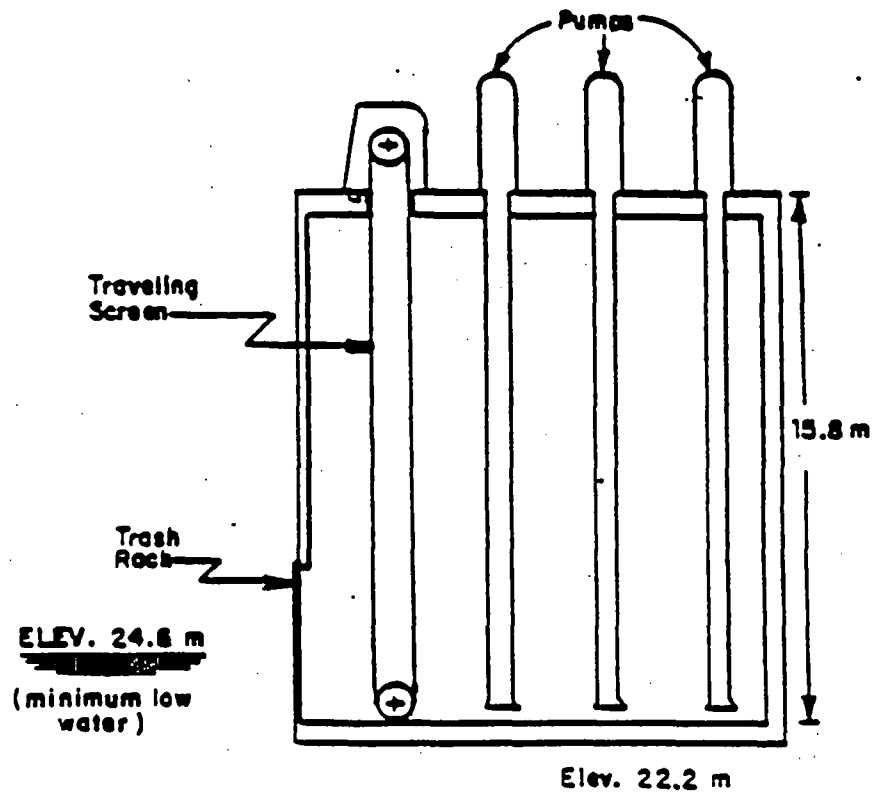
Schematic of 1G and 3G Pumphouse Intake, Plan View
